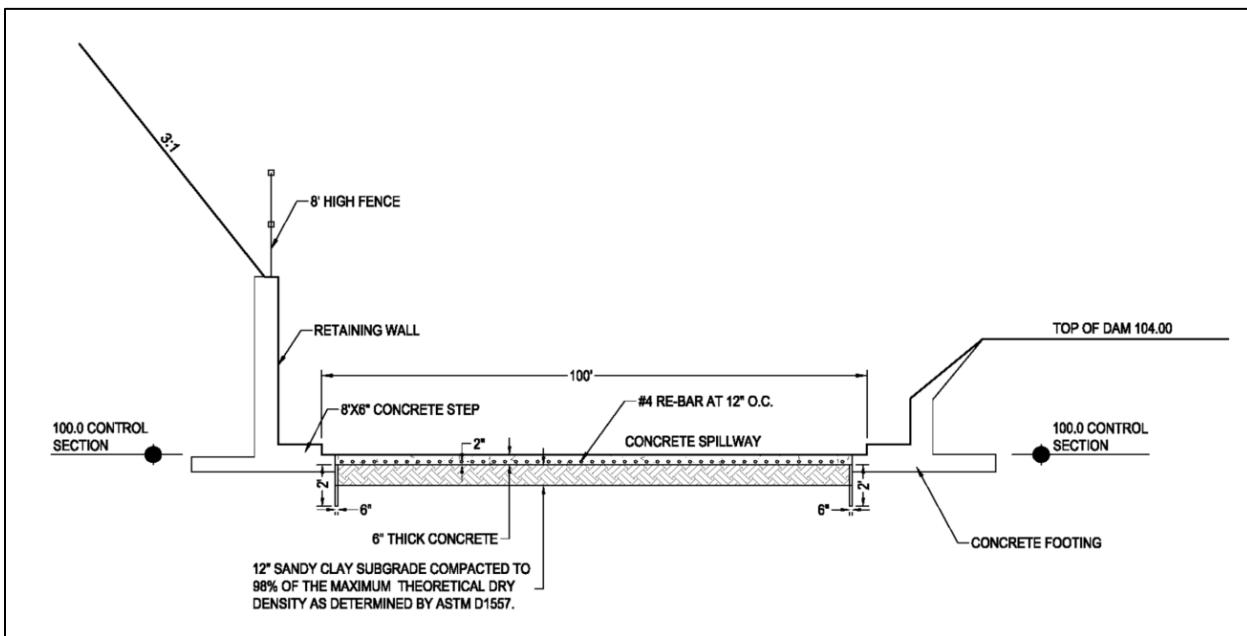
Cross Section of the Dove Pond Dam Spillway (Dove Pond Dam Emergency Action Plan 2021)
